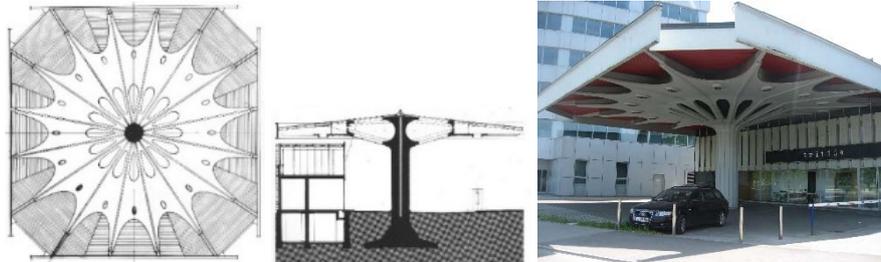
Roof plan [14], cross-section [14], and photo [10] of the Hall C
